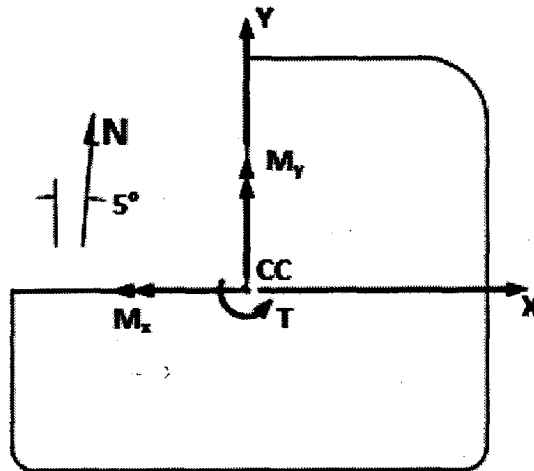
The building floor plan illustrating the center of coordinates and the sign conventions.
